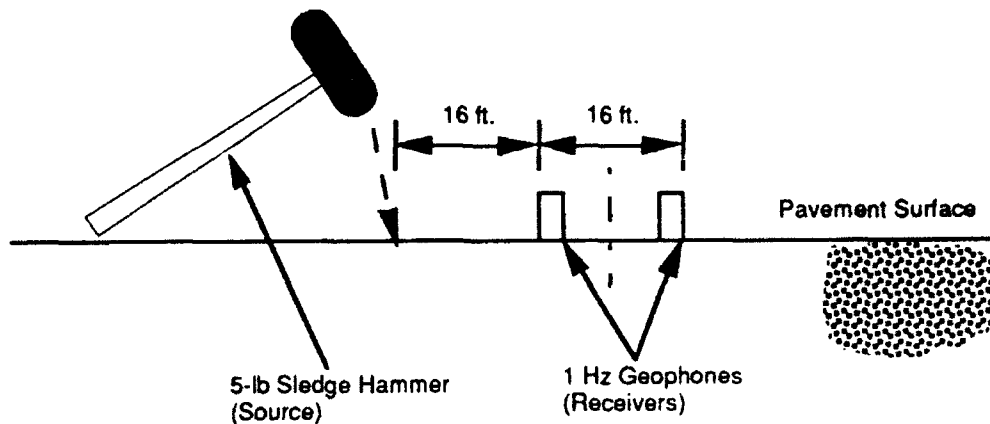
SASW Testing at 16-ft. Spacing with Large Hammer Source
